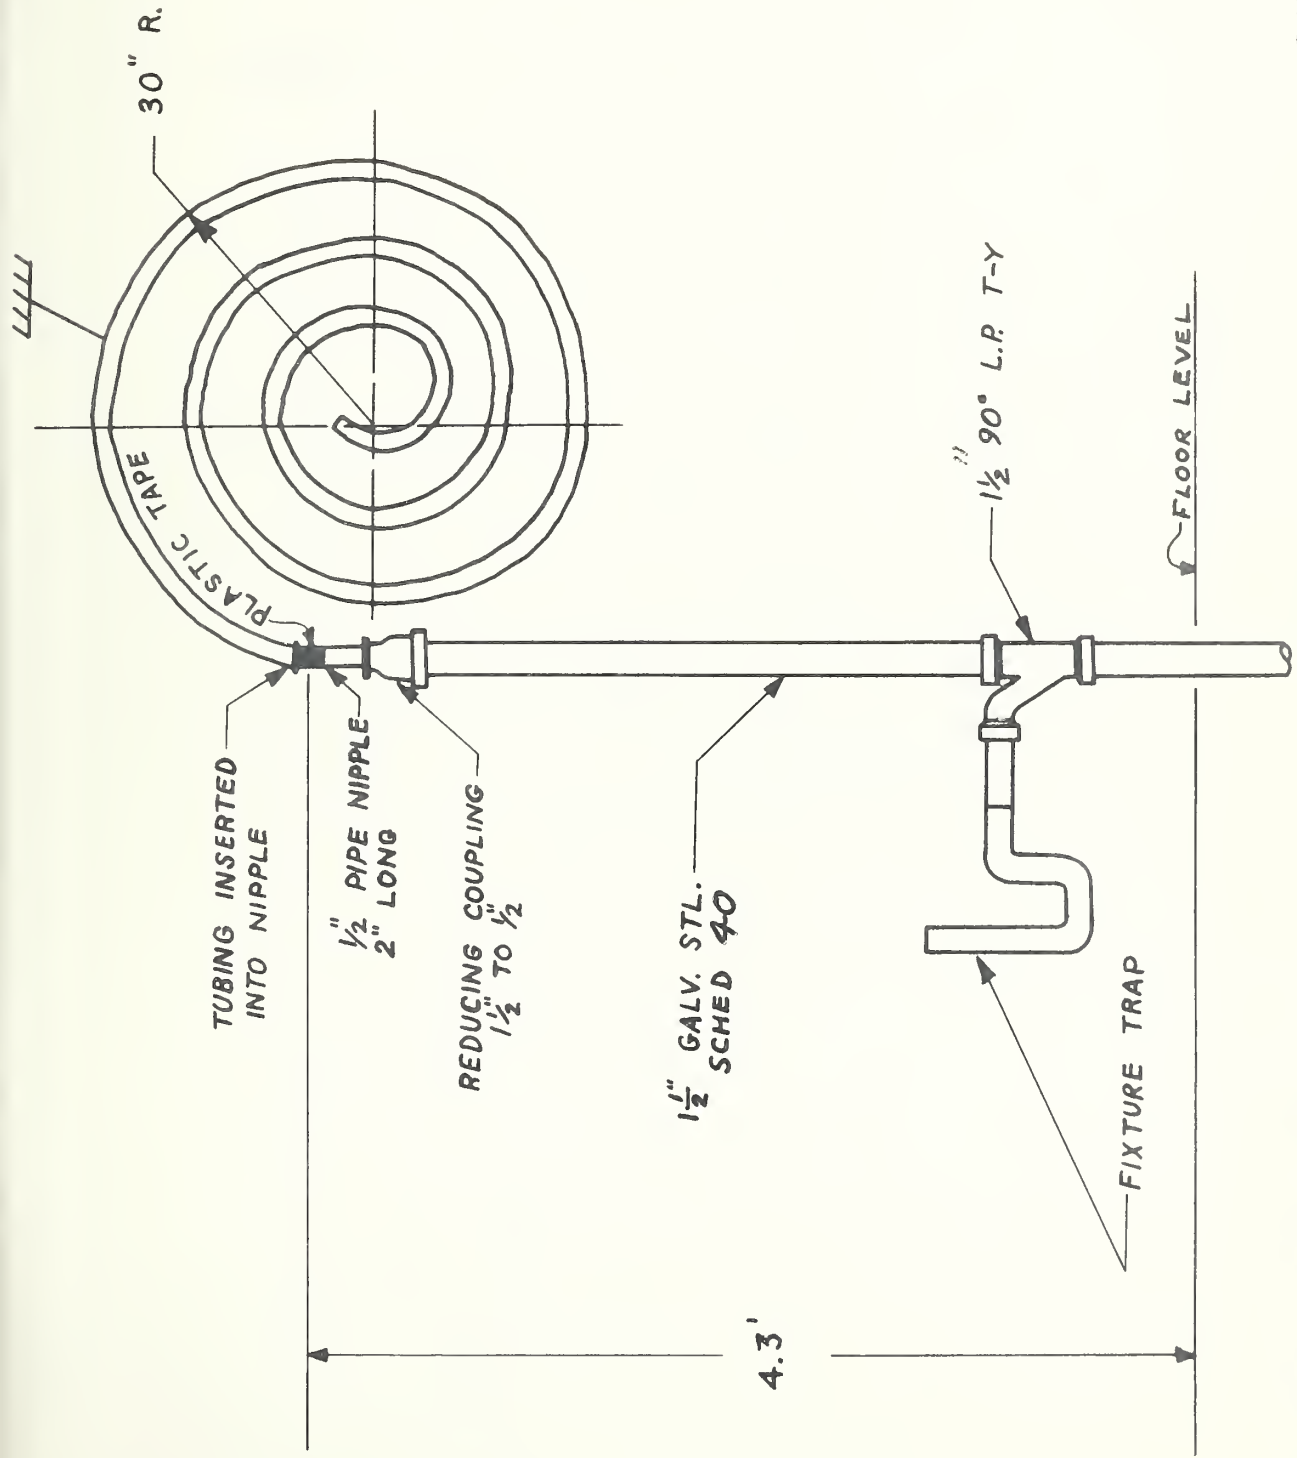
Test vent installation details for fixtures other than water closets using 1/2-in. I.D. tubing 50-ft. long. (The 25-ft. coil had approximately the same radius, and the 1-ft. length was installed without coiling).
